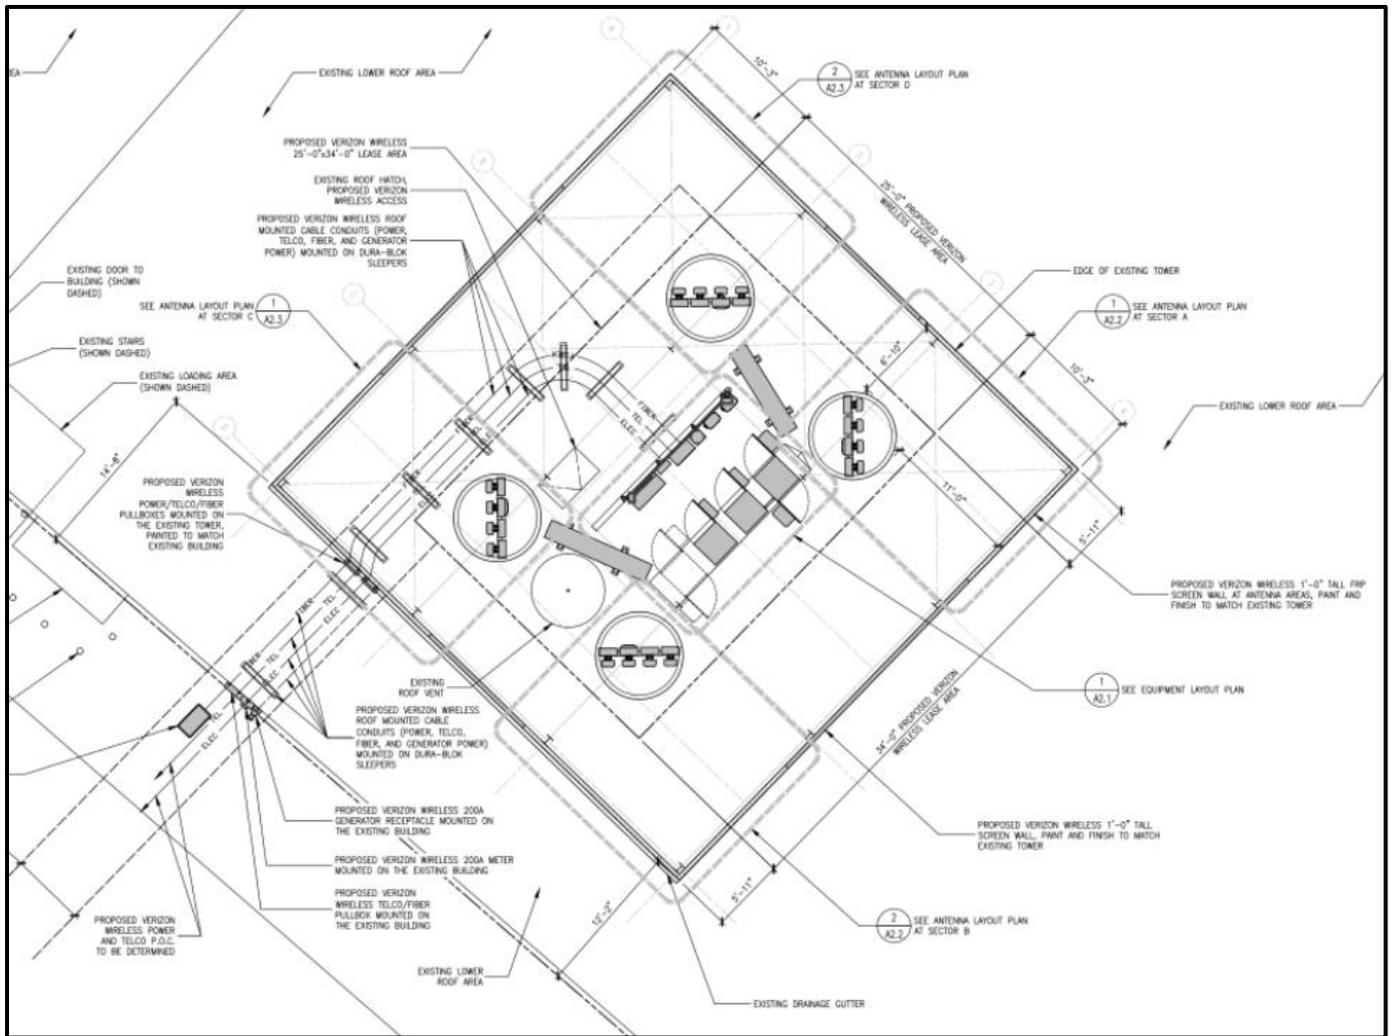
Rooftop Floor Plan (Sheet A1.2)
